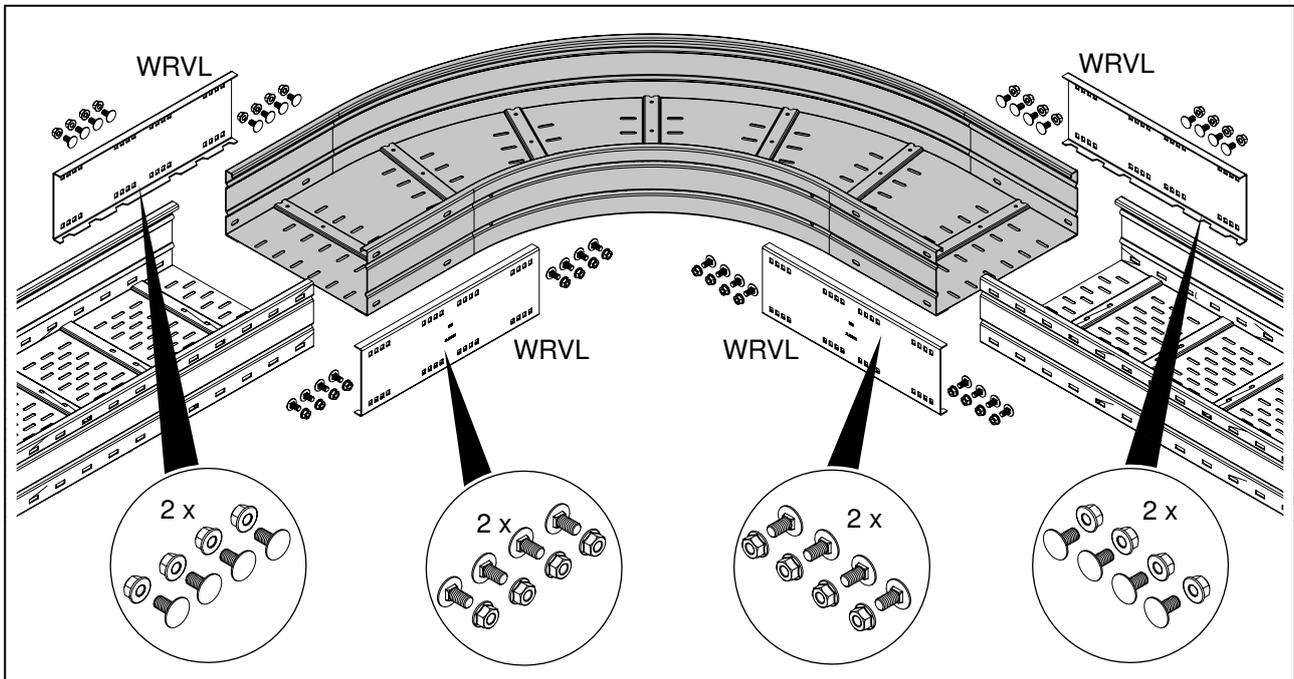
Components for mounting the 90° bend with 160 mm side height
